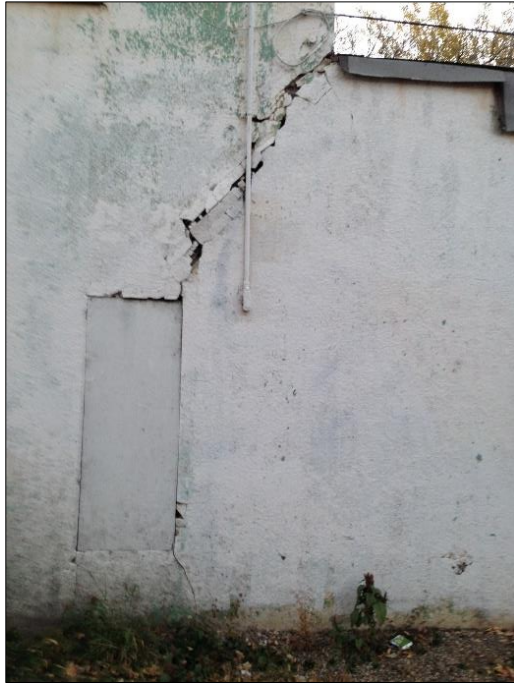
Graphic Arts Building, showing buckling between main building and garage at west wall.
